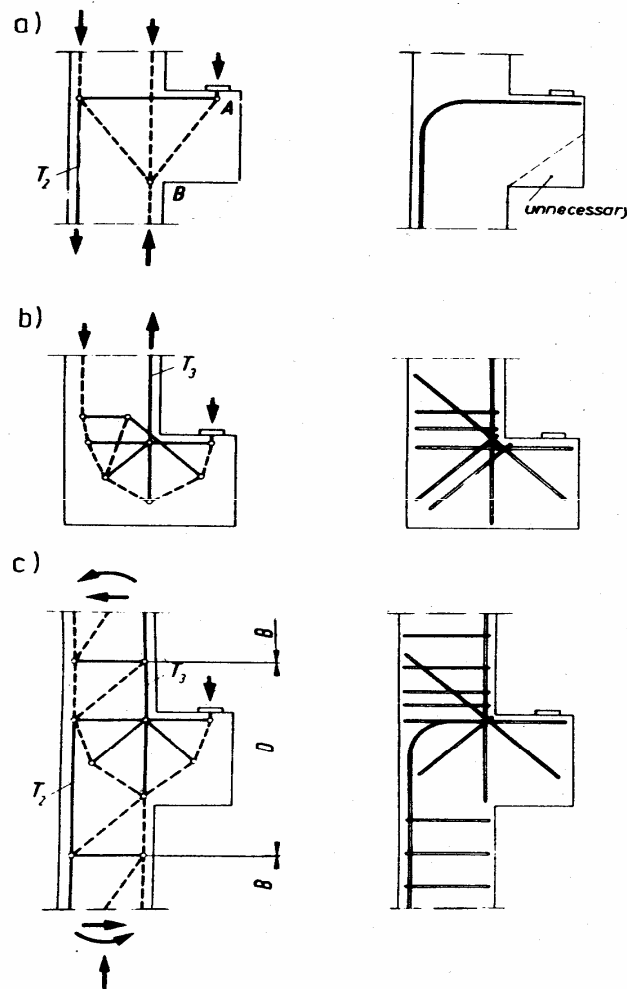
Three typical corbels with different loading, strut-and-tie model and possible structural reinforcement. [1]
